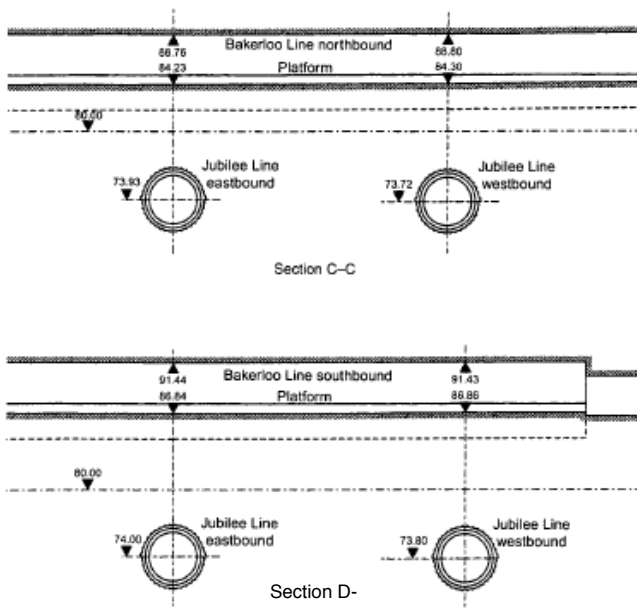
(b) cross-section view of the Bakerloo Line NB & SB tunnels in direction C-C and D-D, with positions of JLE WB&EB tunnels
